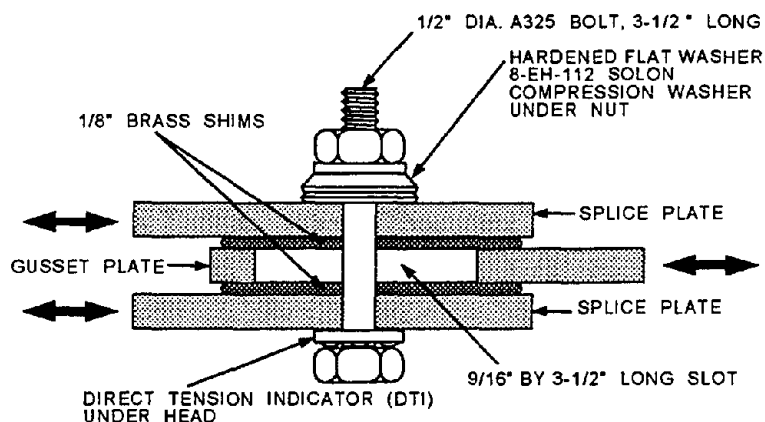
Typical detail of a Slotted Bolted Connection (SBC).
